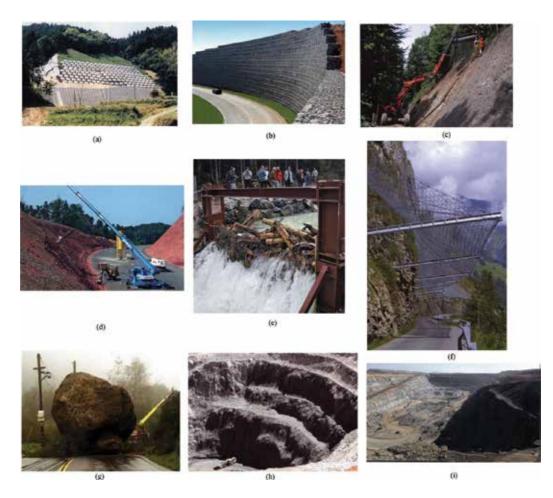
(a) Anchor construction—Japan. (b) Strengthen wall—Switzerland. (c) Slope defense by flexible metallic net— Switzerland. (d). Slope protection by flexible metallic net—Switzerland. (e). Barrier for retaining debris flow—Switzerland. (f) Ring metallic net protection above road against rockfall—Switzerland. (g) Big stone on the road. It is possible to make it fall down, to break, or to reinforce by cement on the slope of the road. (h) Rock slope surface stabilization and rockfall hazard mitigation using coated double-twist rockfall mesh. Australia. Mining company Barrick (Australia Pacific) Ltd., 2010. (i) Rockfall mitigation drapery using double-twist rockfall mesh—South Africa. Mining company Anglo-platinum, 2009.
